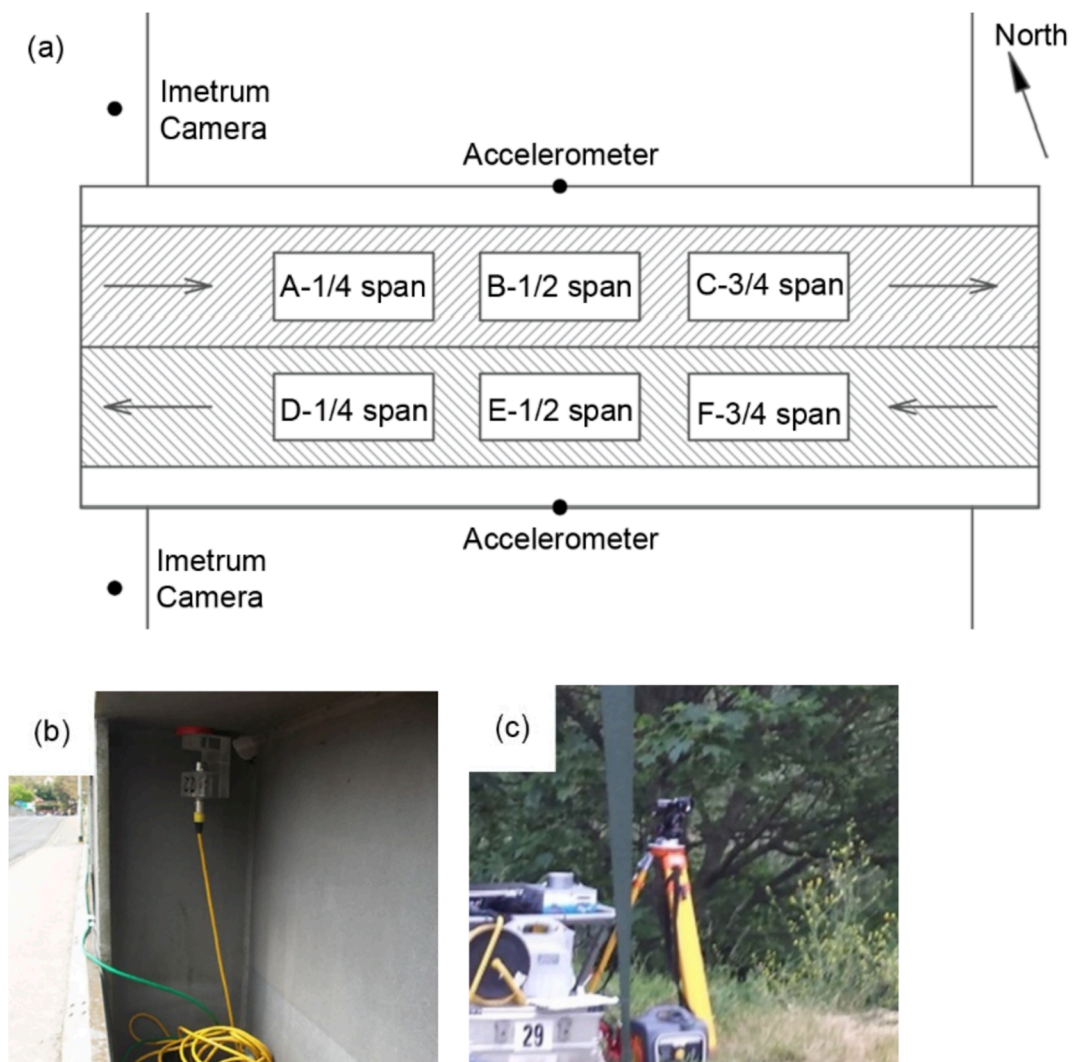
Test set up, (a) Plan view of Station Road Bridge marked up with equipment locations, direction of travel, stopping positions and support conditions, (b) accelerometer attached to bridge, (c) Imetrum camera on tripod on western bank.
